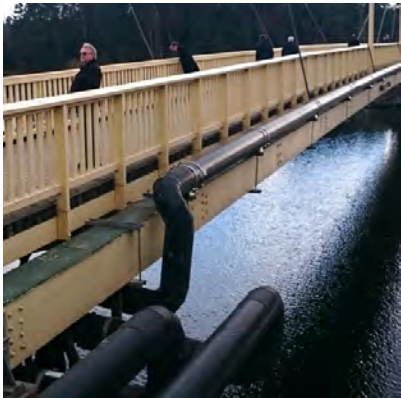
Acceptable design, the tube is installed afterwards, in this case on top of the beam. The risk is moisture from the tube to the beam and problem to inspect the covering on top of the beam.
